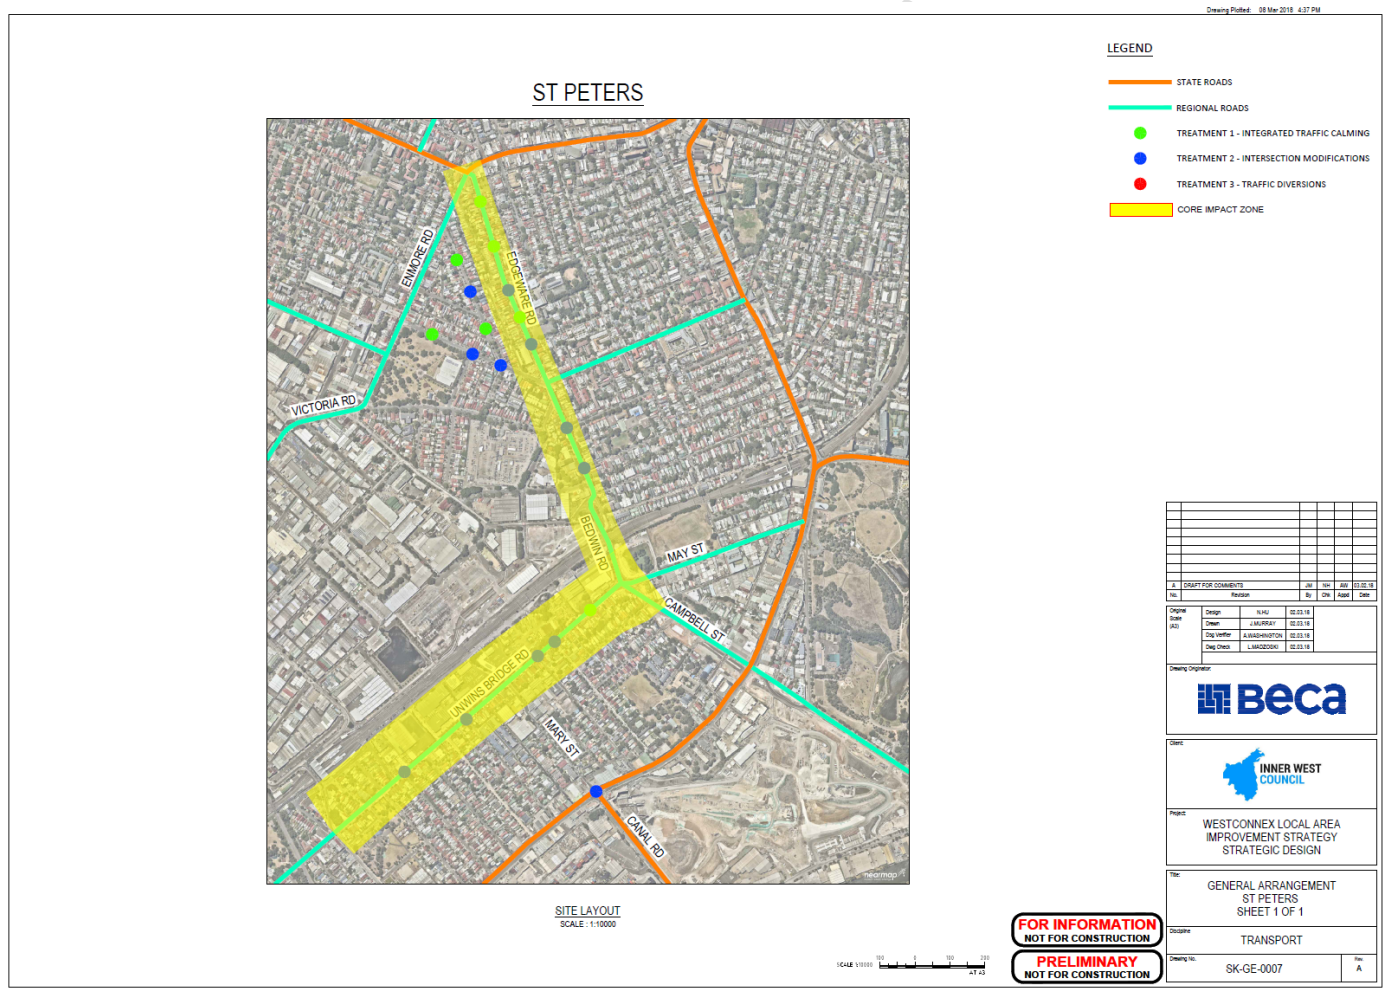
Local Area Improvement Strategy 2018 Concept Plan for Edgeware Road
